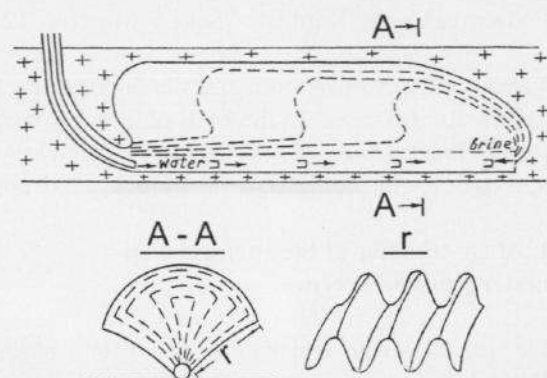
Underground horizontal reservoir. Longitudinal and vertical section. Cross section A-A,  $r$  – ridged surface.
